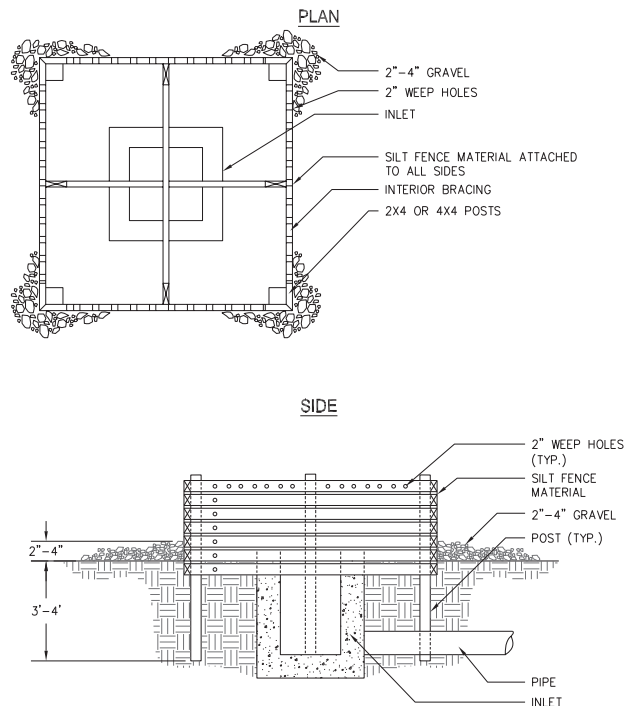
Baffle Box Installation Requirements (Sd2-B)
